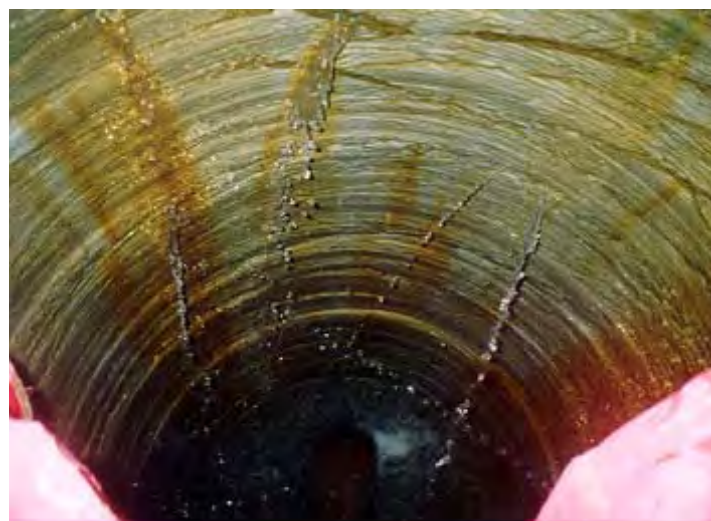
Excessive Seepage Precludes Free Fall Placement of Concrete (PennDOT photo)
